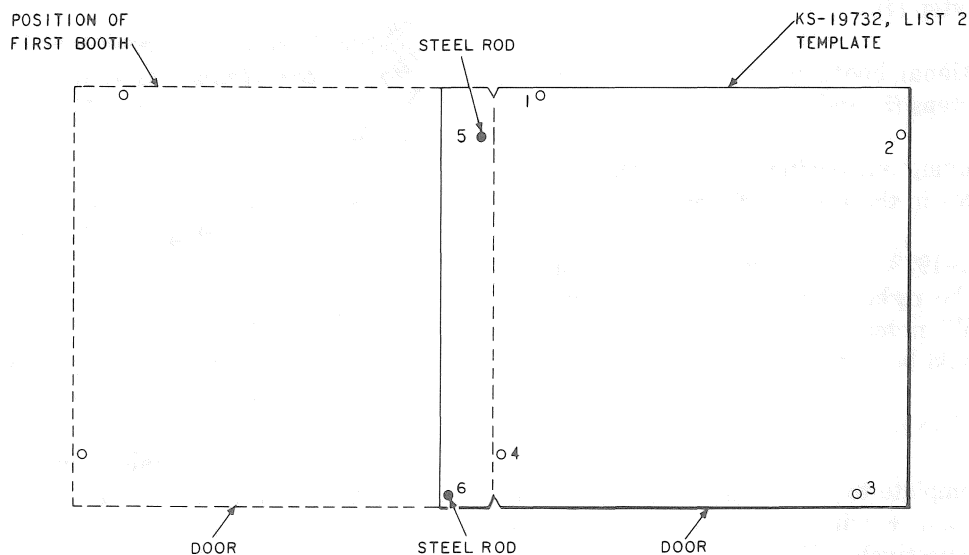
Left to Right Layout for Drilling Mounting Holes
